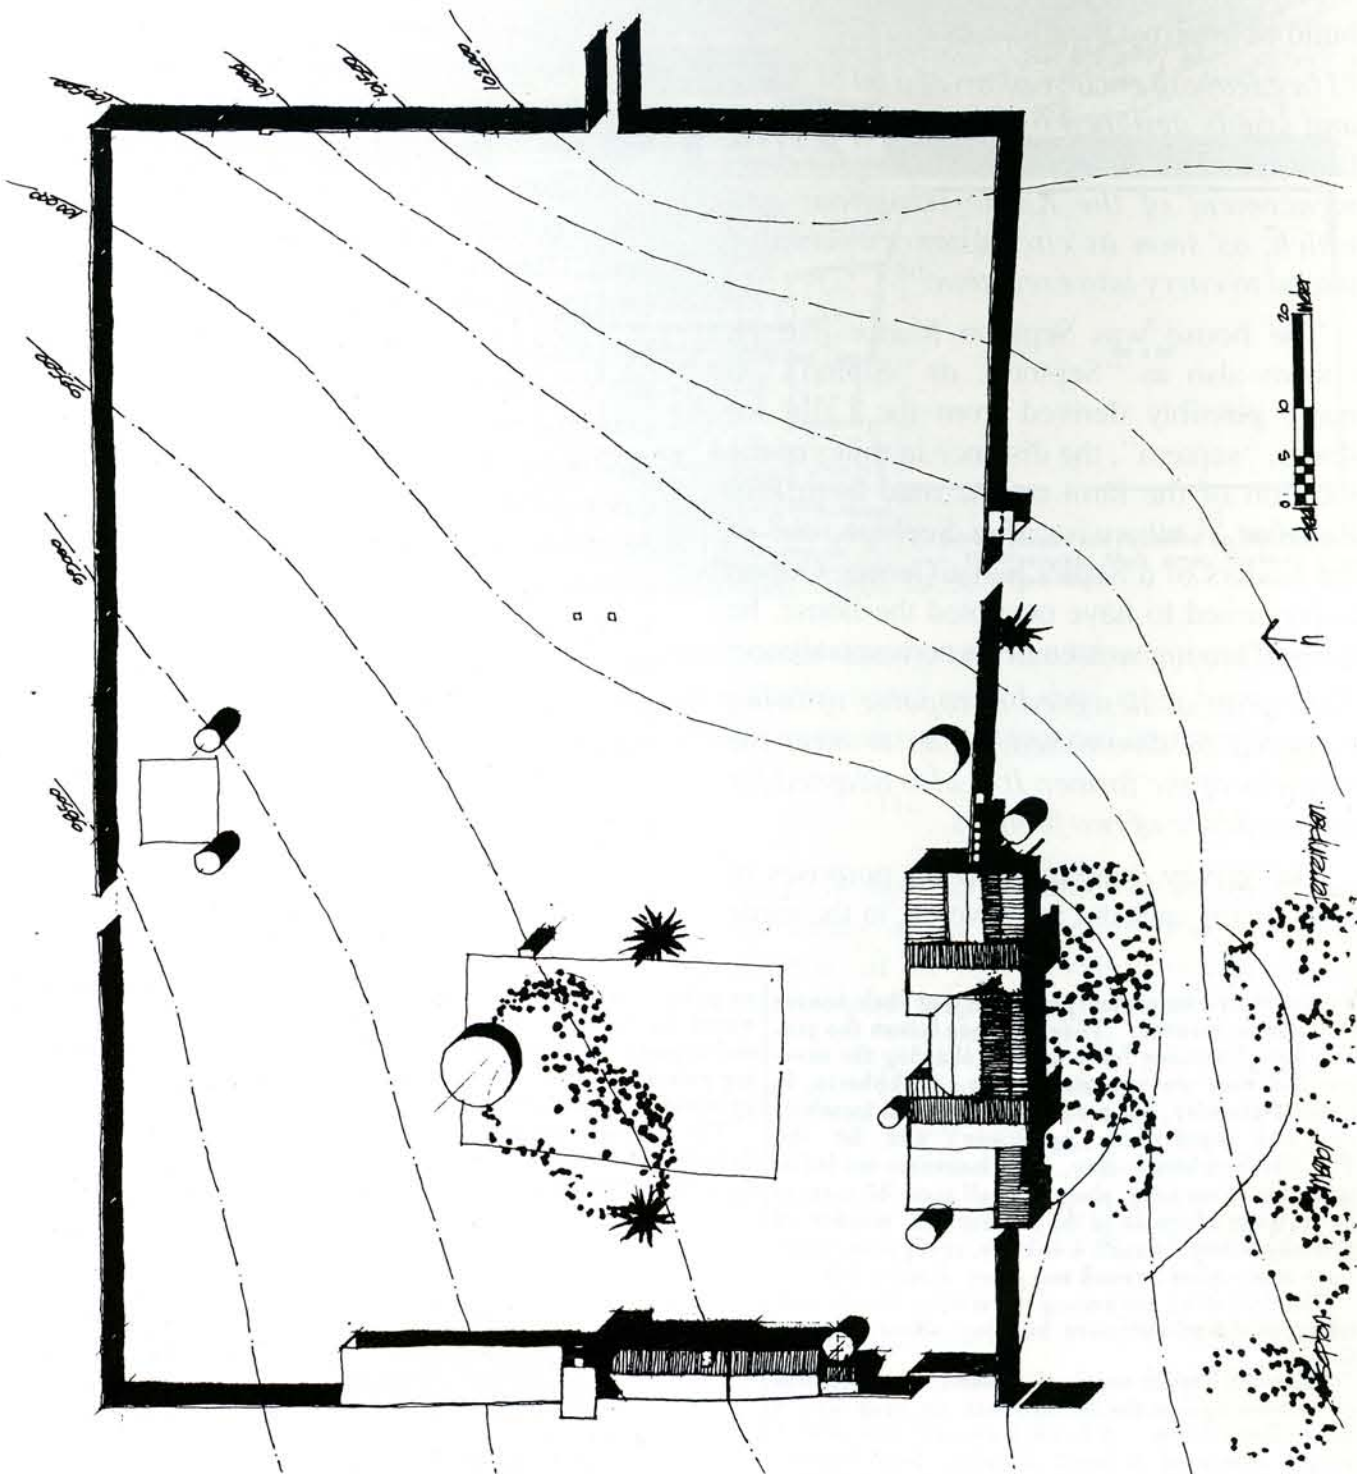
Site plan after measured drawing, 1986, showing walled kraal, house and outbuildings (P Boshoff, delt).
